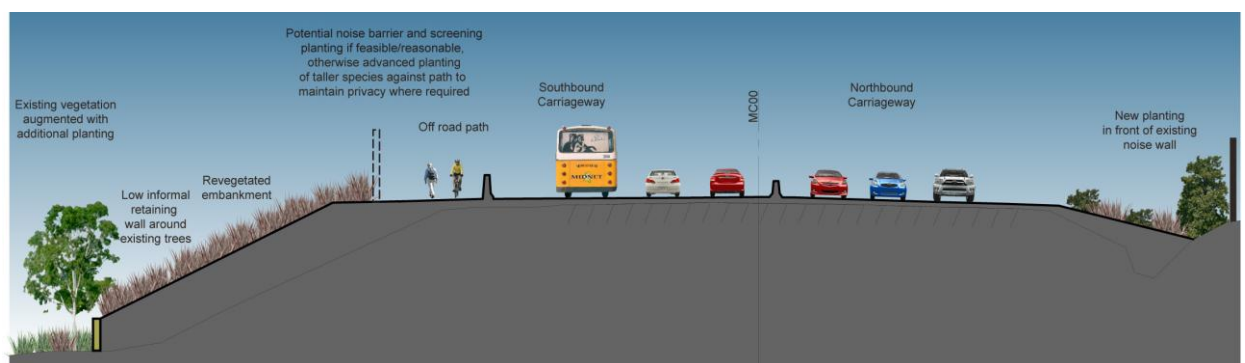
Indicative road cross section 1600 metres south of Alfords Point Bridge
